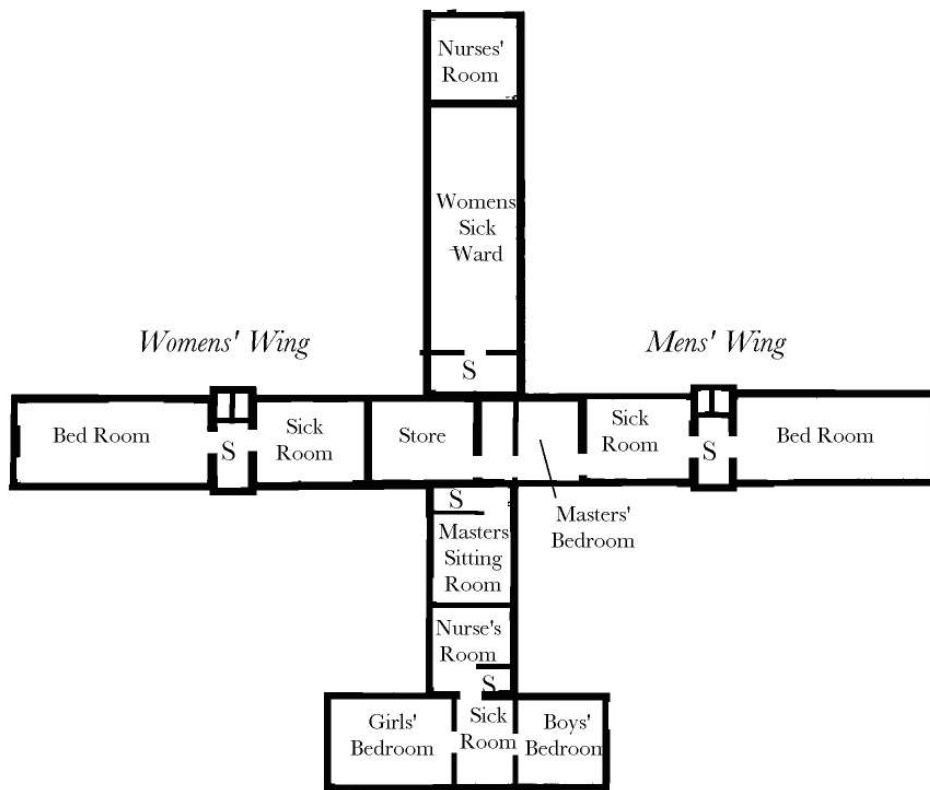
Possible reconstruction of the original first-floor layout of Okehampton Workhouse as completed in 1838.
